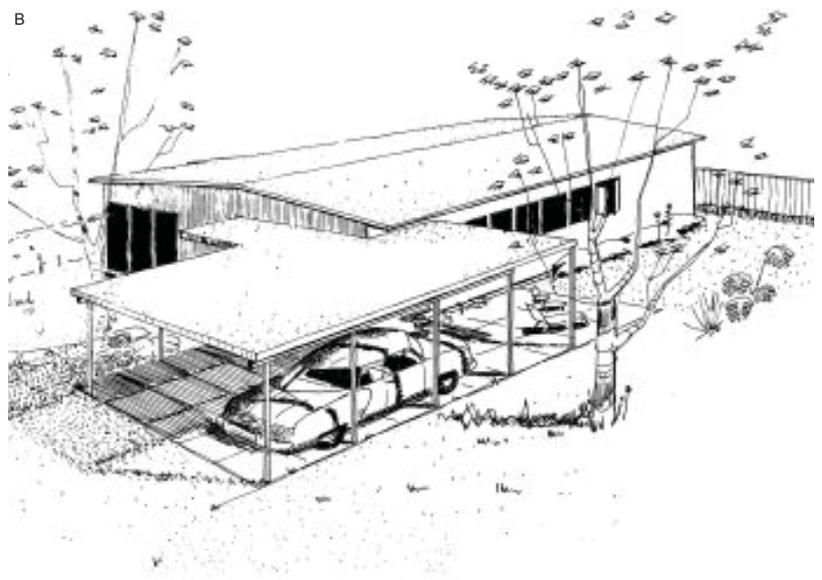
The Packaged House System. Built prototype. 1947
